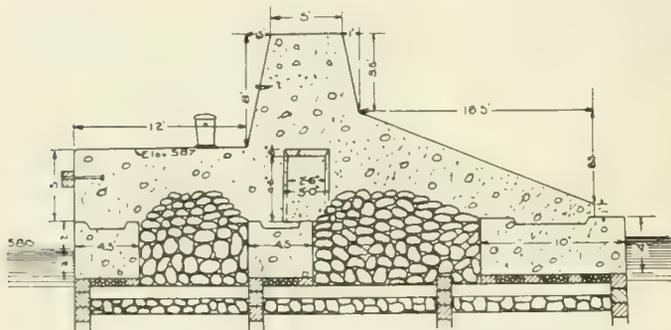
Cross Section of Concrete Superstructure Harbor Beach Breakwater.
